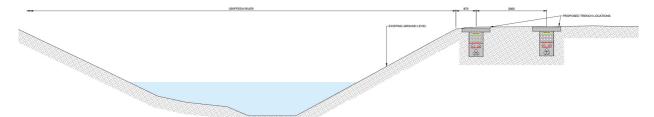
Typical cross-section of transmission lines to the north of the Griffeen River (Source: Drawing no. 20 167-CSE-GEN-ZZ-DR-C-2130, CSEA Consulting Engineers)
